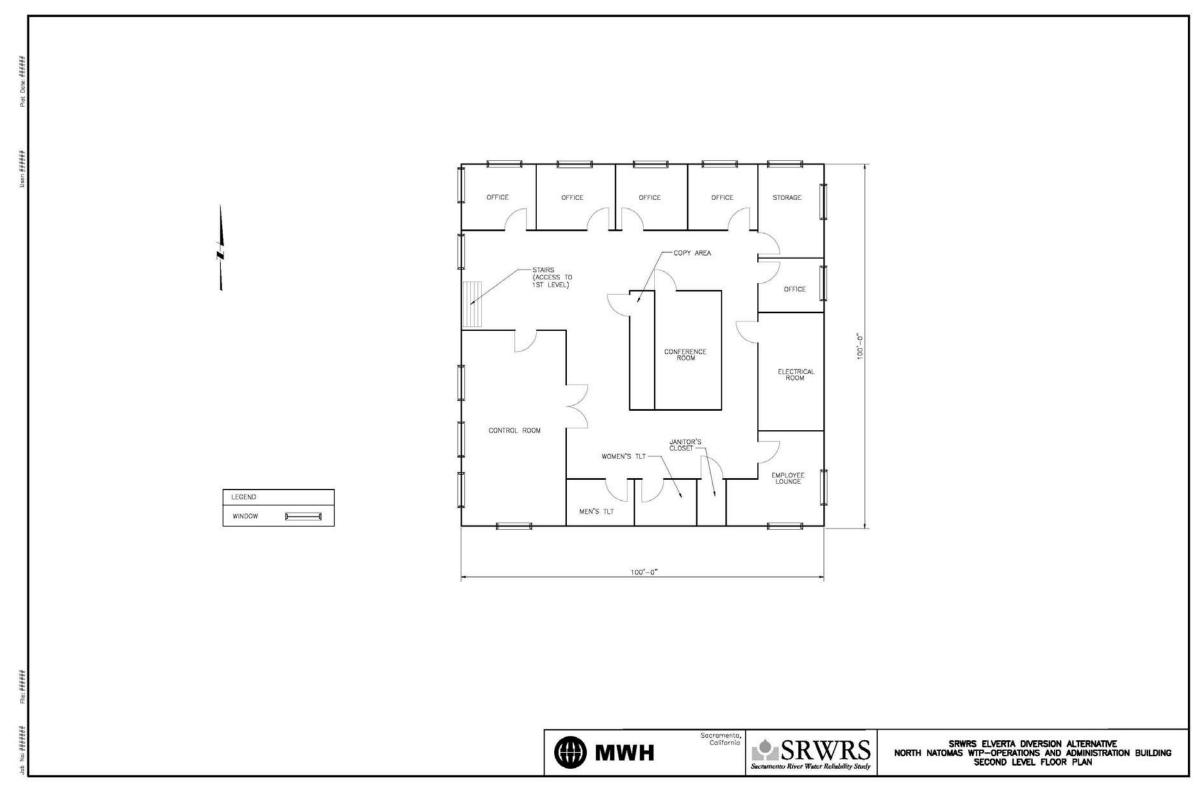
North Natomas WTP – Operations and Administration Building Second Level Floor Plan
